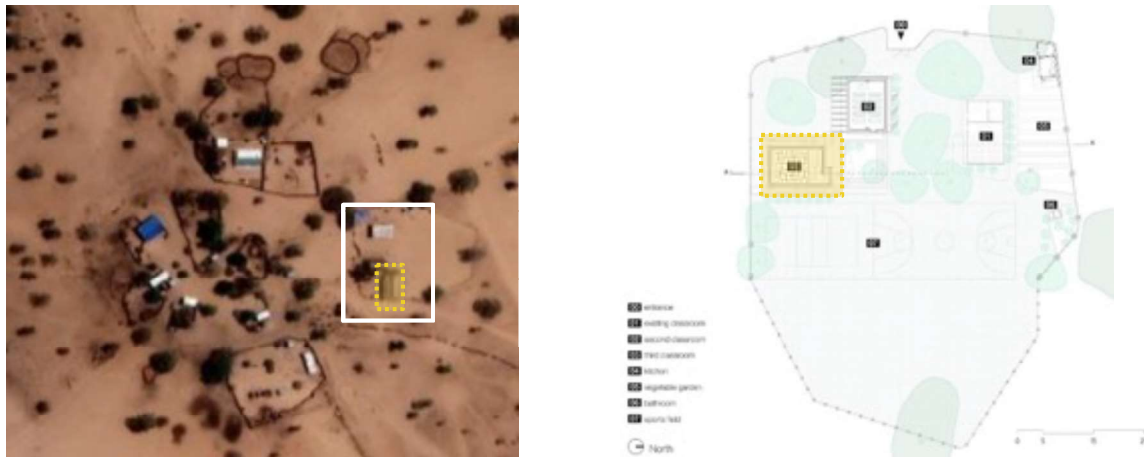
(a) Aerial view and (b). ground plan of the Mbakadou primary school.
